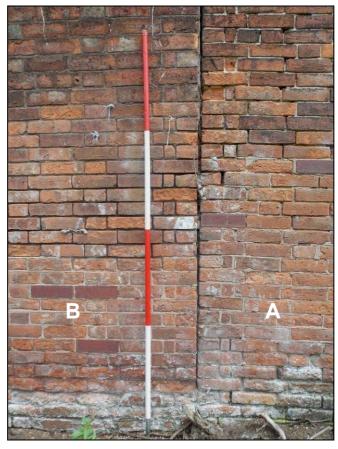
Detail of construction joint between Buildings A and B, looking east (scale 2m).
